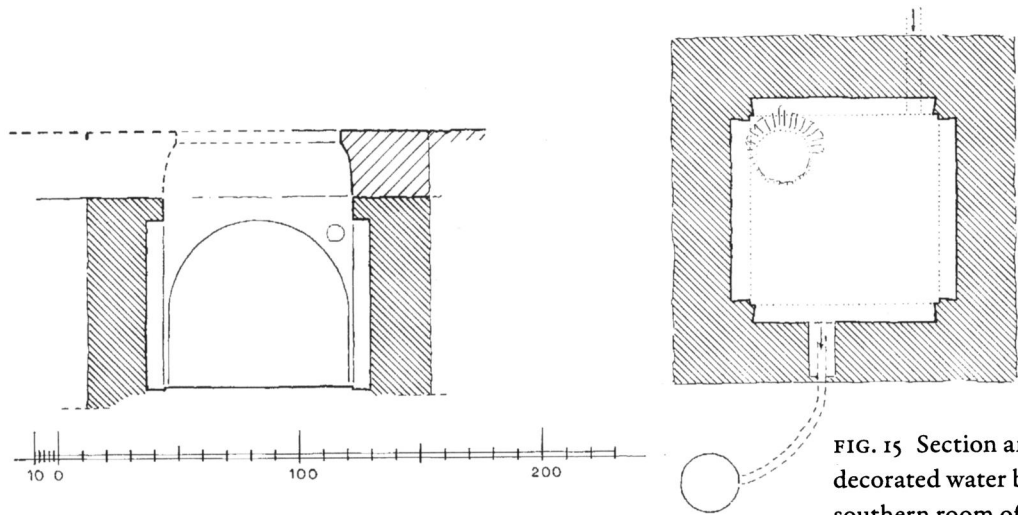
Section and plan of the decorated water basin in the central southern room of the building with the cruciform pillars
